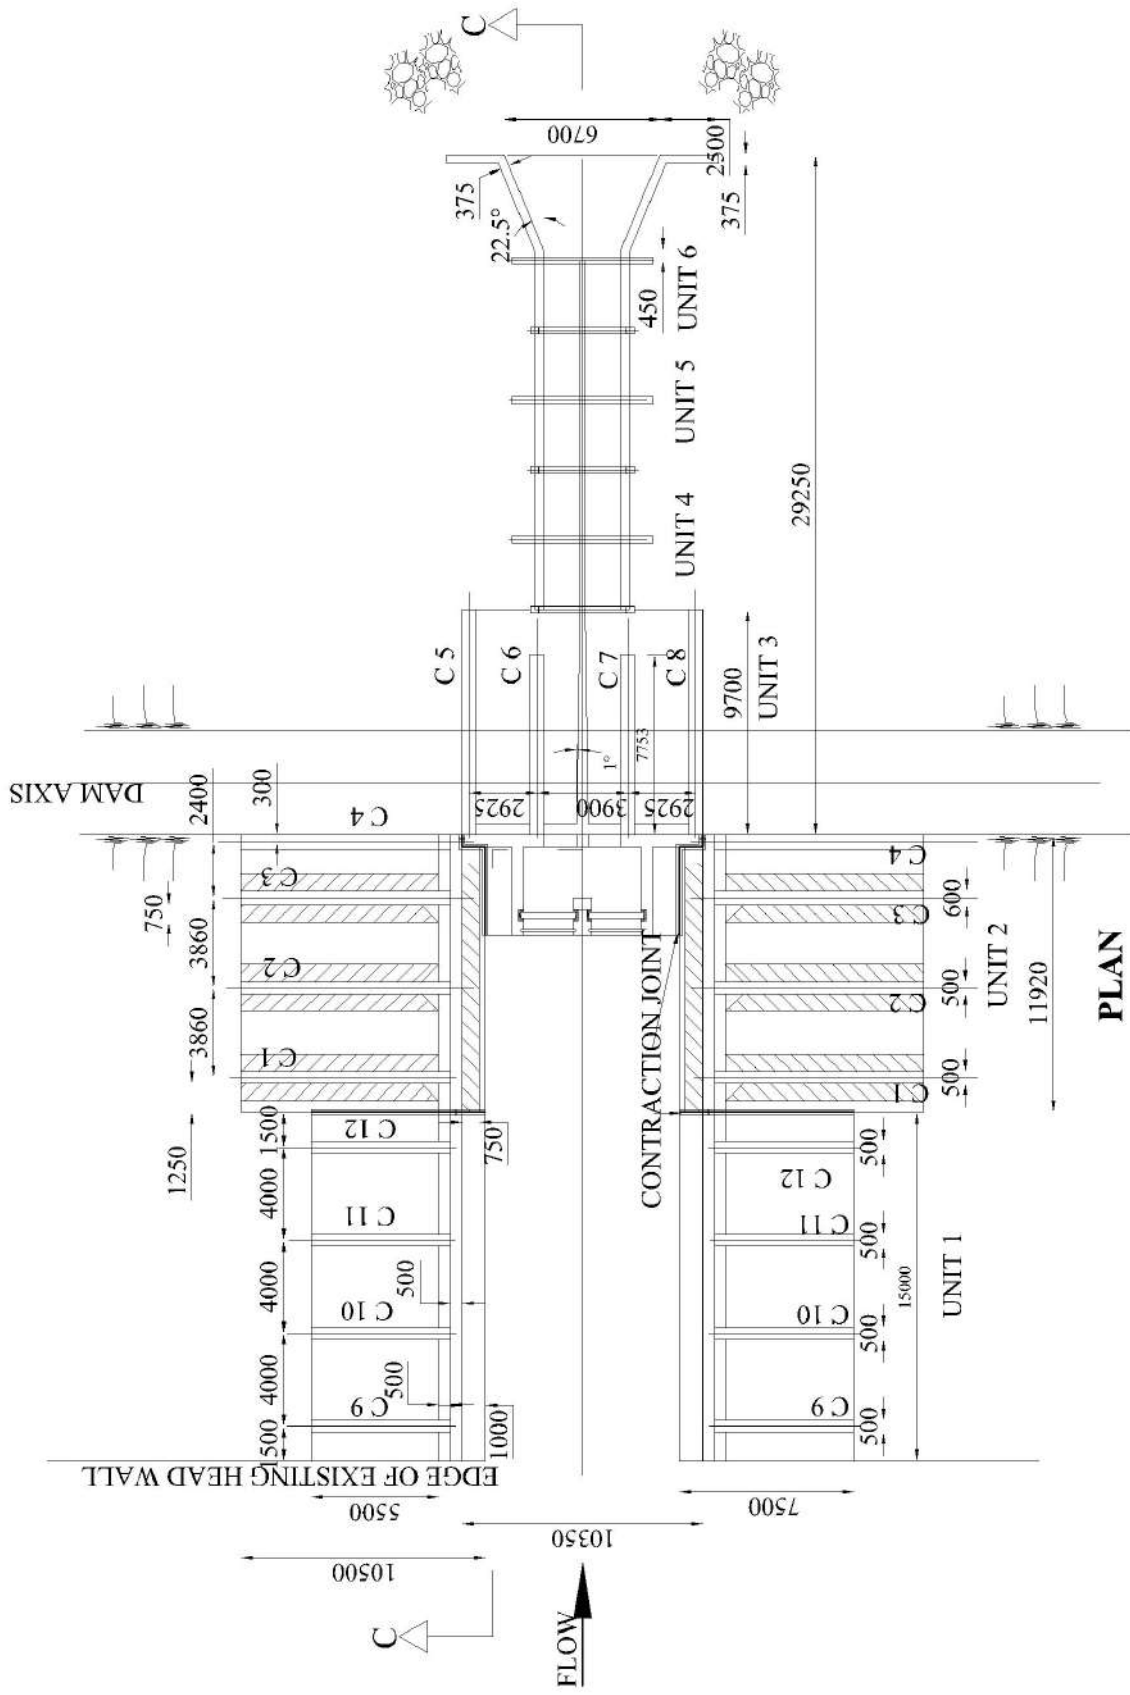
Sectional Plan of Proposed Sluice of Nachchaduwa Tank
